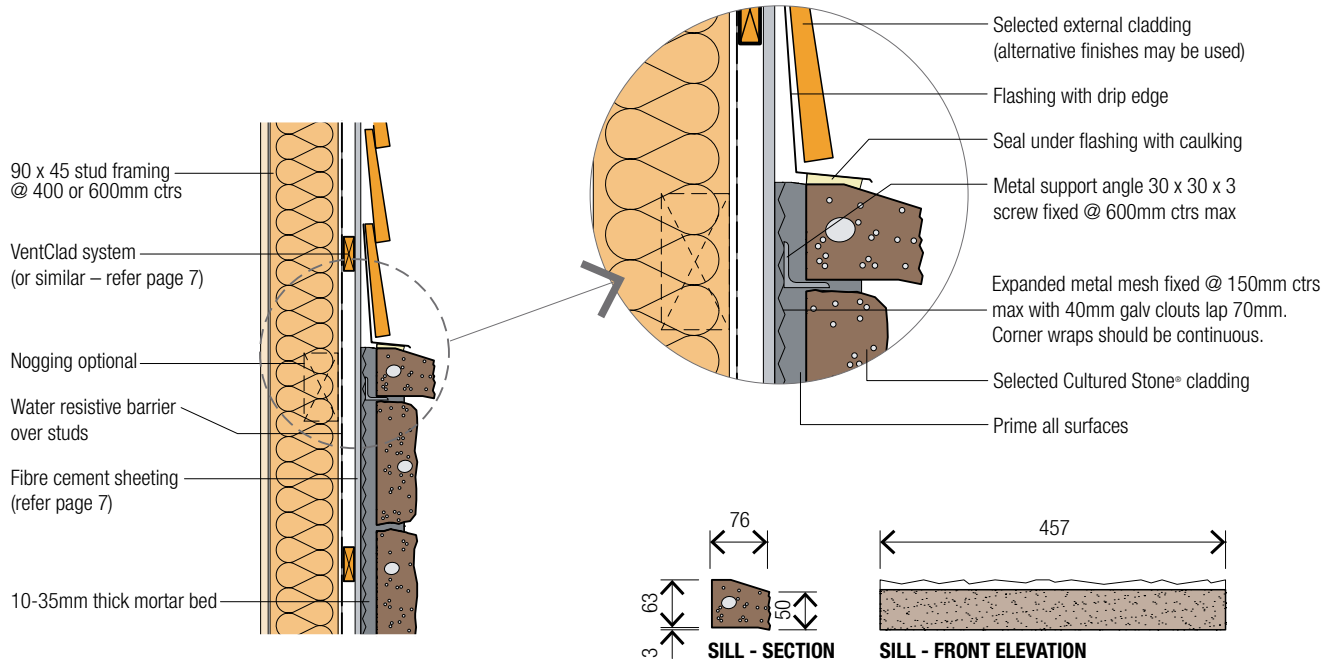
Sill Cladding Transition - Section (Dwg # CS-06.03)
